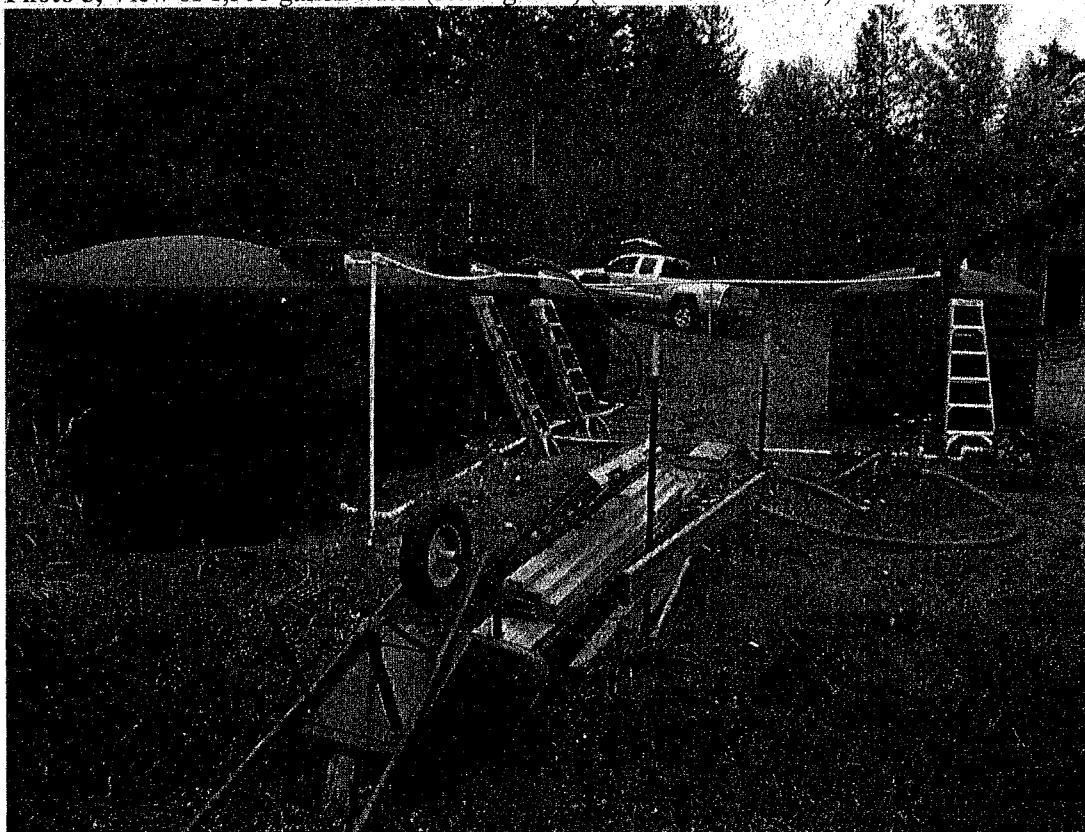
, View of 4- 2,500 gallon water tanks (Photo taken 7/31/18).
